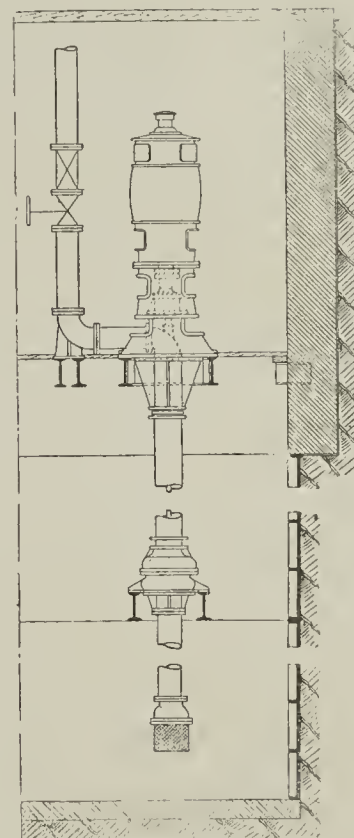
SUBMERGED ELECTRIC PUMP, WITH SHAFT MOUNTED IN STANDPIPE.
